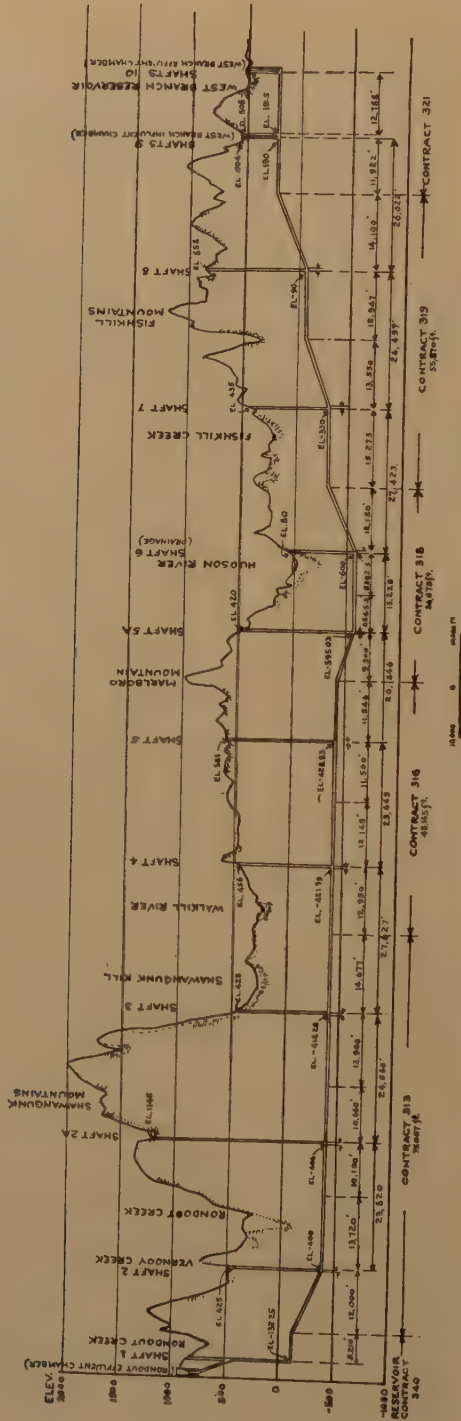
PROFILE OF RONDOUT-WEST BRANCH TUNNEL SECTION OF DELAWARE AQUEDUCT.
